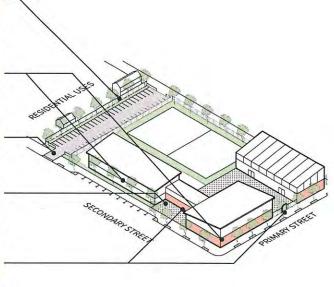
Mid-Block School outside General Plan Growth Areas - A school outside General Plan Growth Areas with buildings oriented towards the street, on-site parking, off-site drop-off areas, and direct pedestrian access from the public realm.
